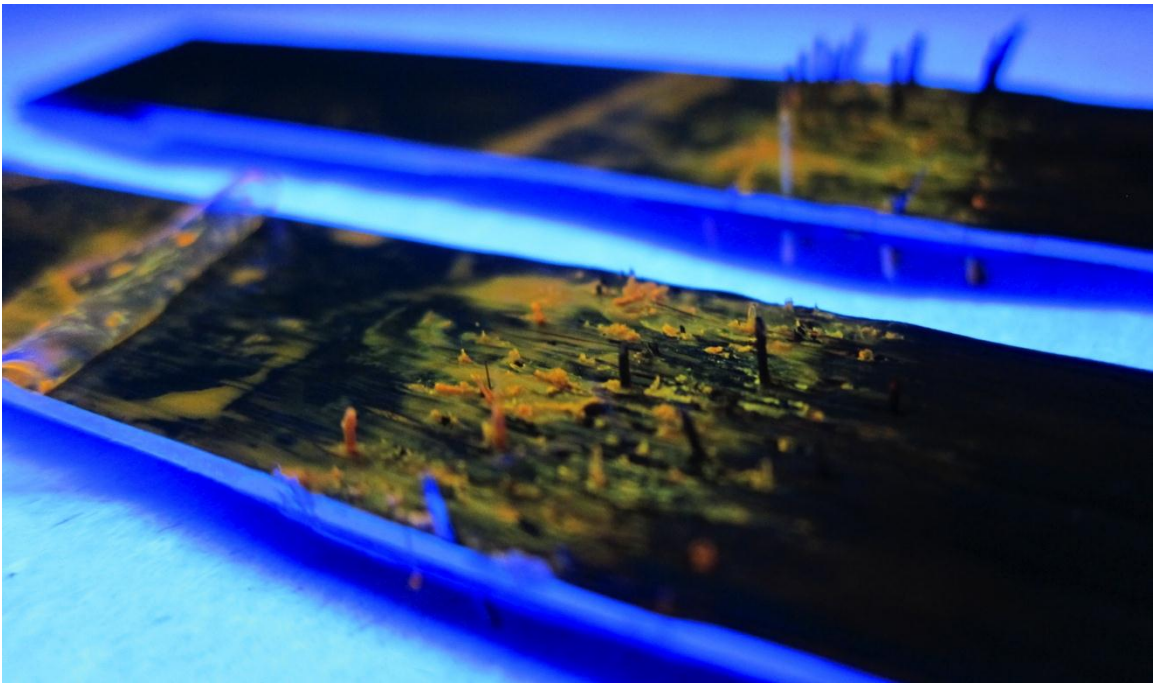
Ultraviolet light image of fracture plane for specimen 7B
